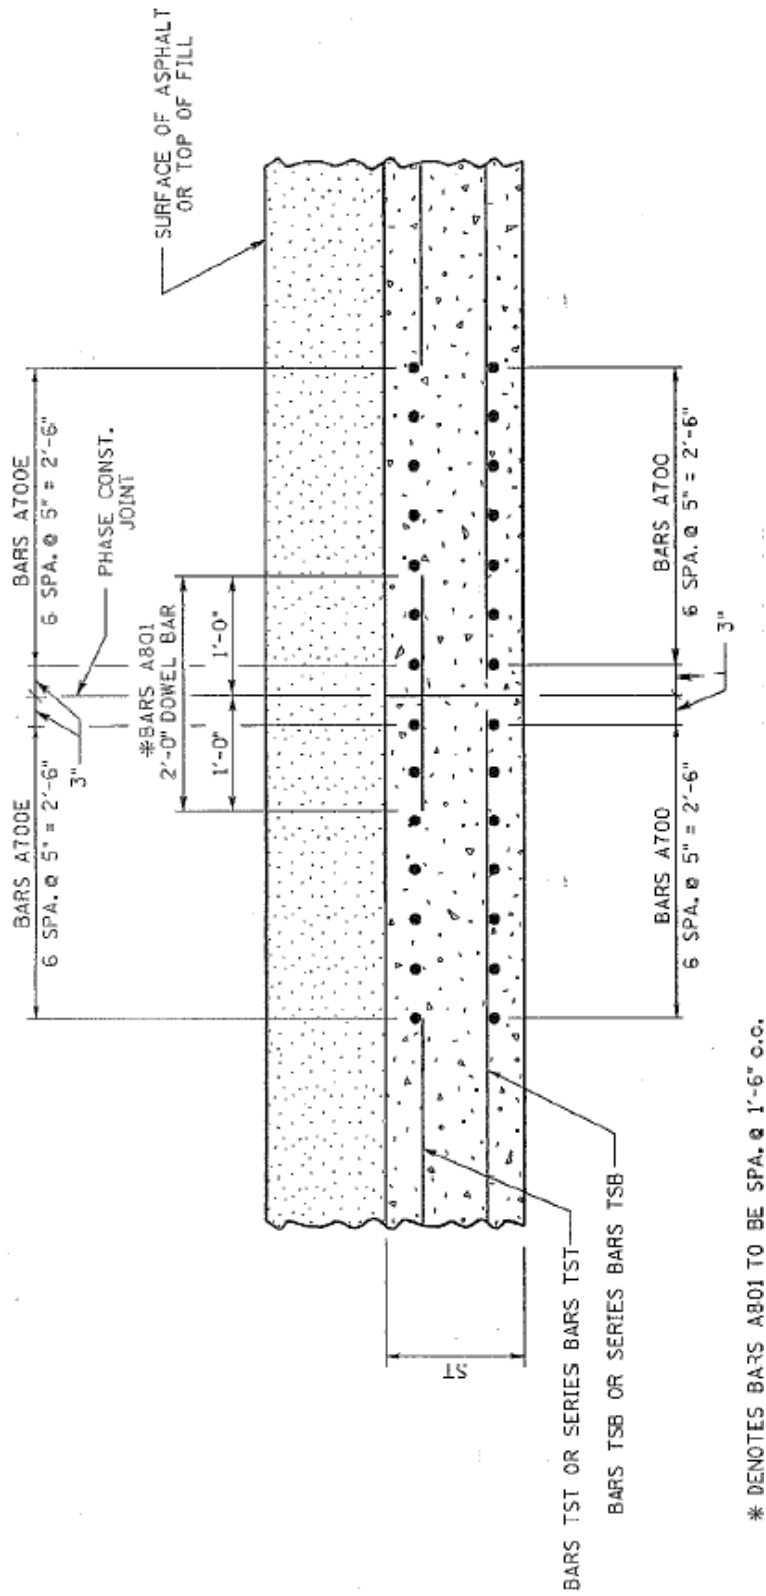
TDOT Box Culvert Stage Construction Joint (TDOT 2000b)
